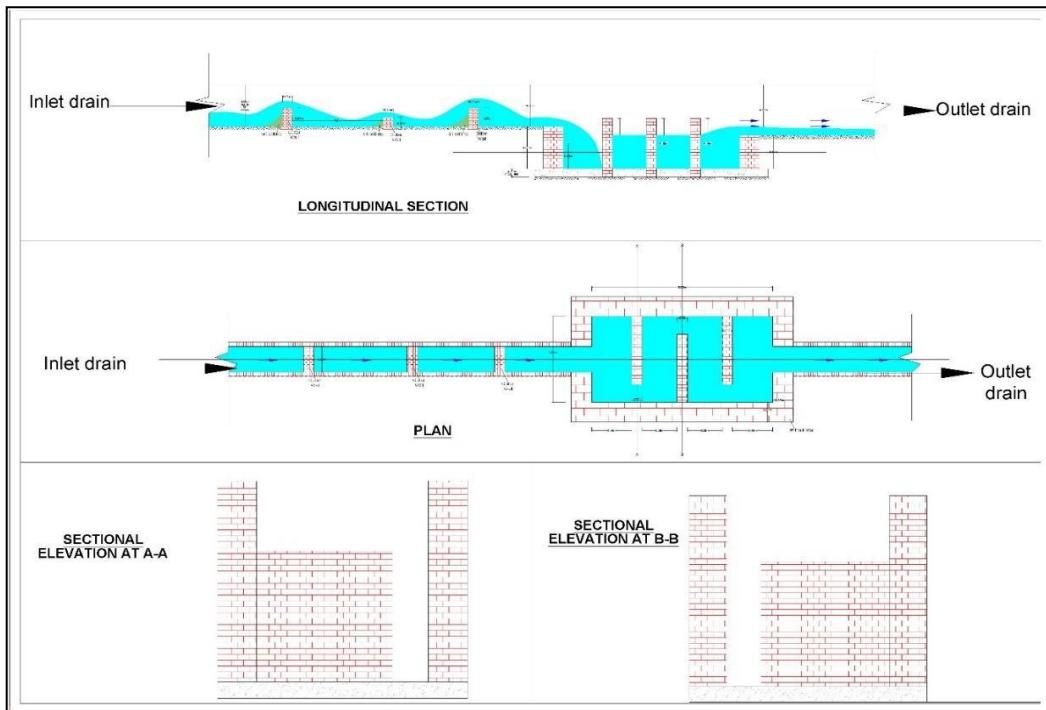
Plan and Sectional view of De-silting Chamber and Gutters
